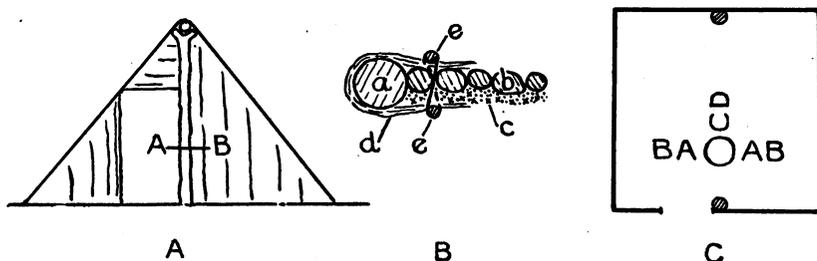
A, front elevation of house; B, section A-B; a, jamb; b, wall-poles; c, matted brush and grass; d, grass placed over jamb; e, sticks sewed together to hold grass in place; C, ground plan: AA, brothers, and BB, their wives, C, D, a stranger and his wife.
